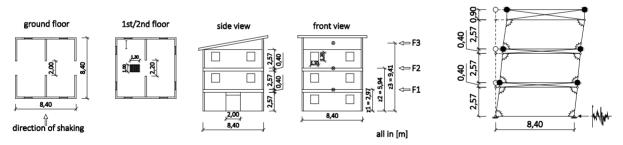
Left: Case study building. Right: 2D model of case study building.
